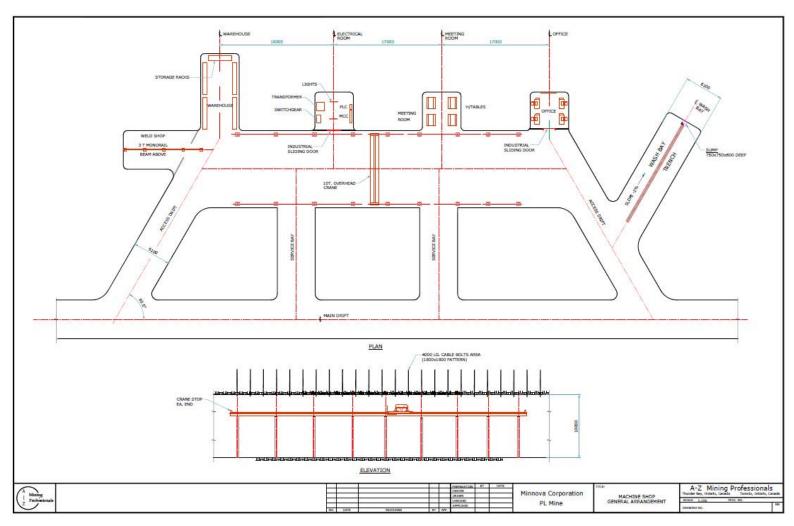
Typical Underground Shop/Service Bay/ Wash Bay
